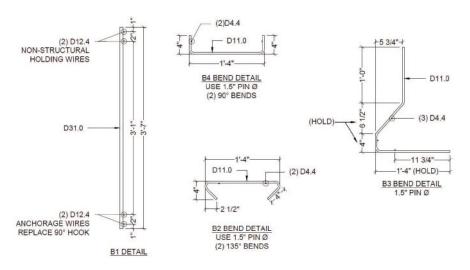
A mat diagram in a typical WWR submittal shows welded wire reinforcement sectional geometry, wire size, and bend arrangement.
